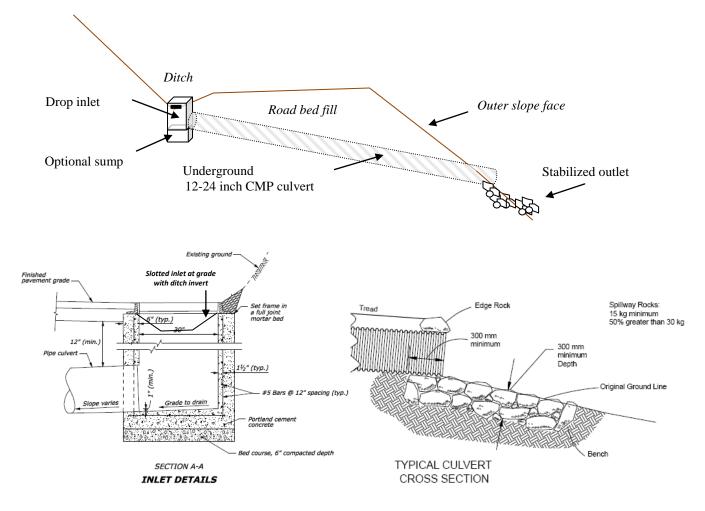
Representative road cross section (above), typical inlet (bottom left) and stabilized outlet (bottom right). The inlets should have slots at grade with ditch inverts.
